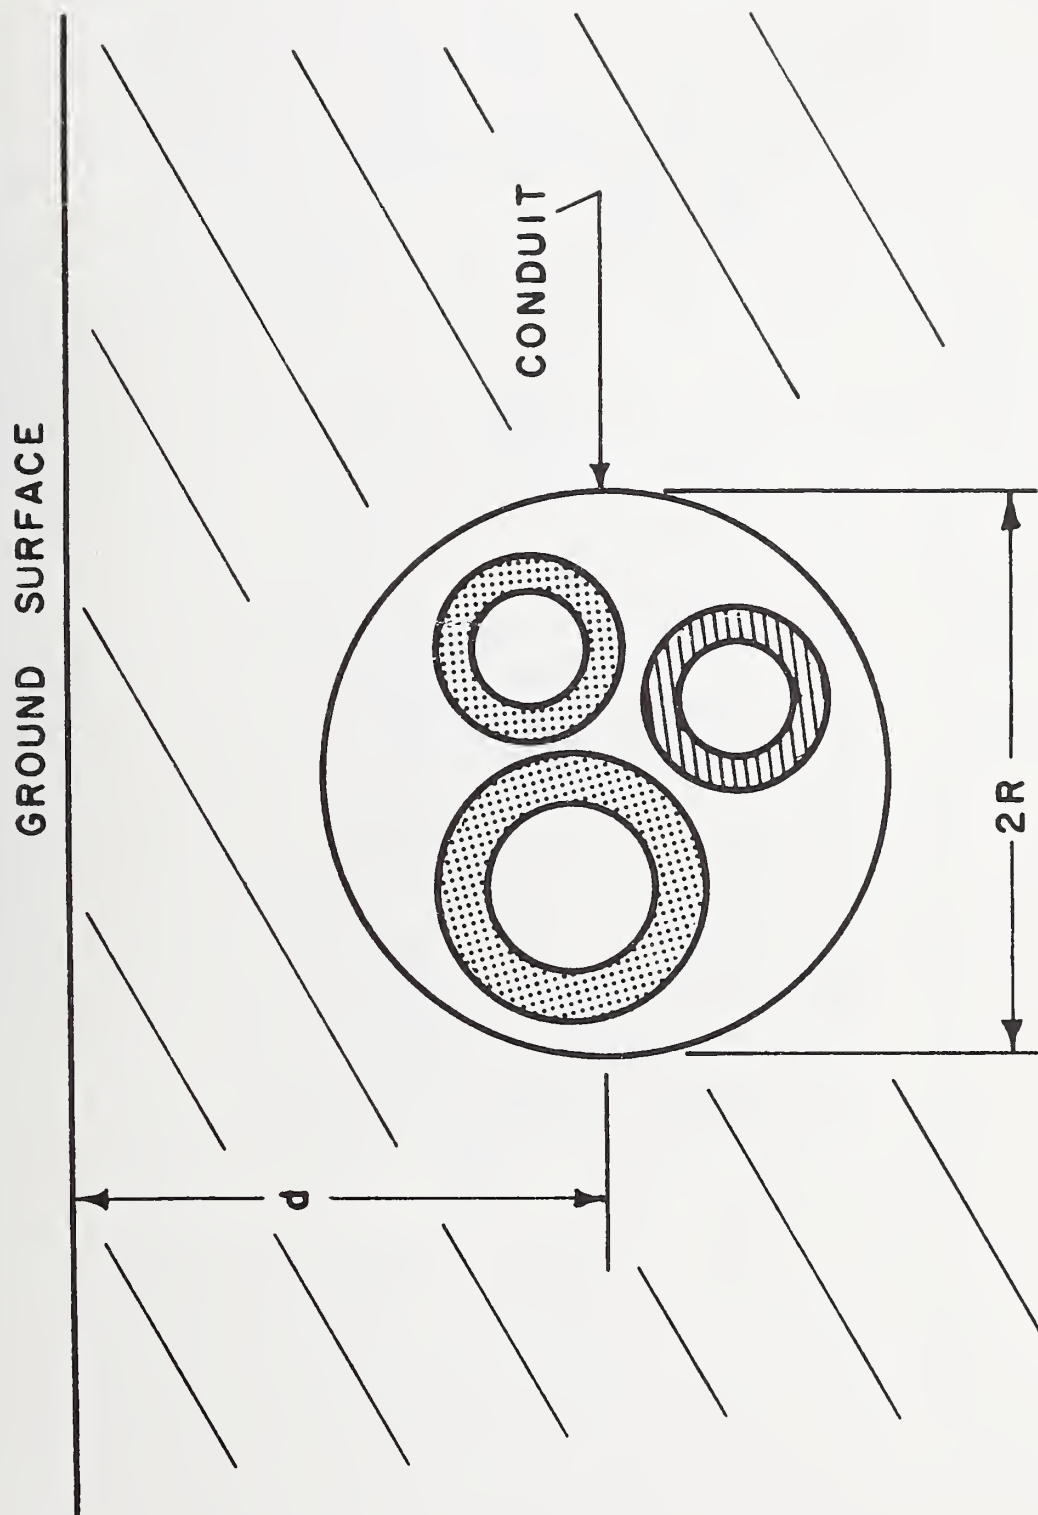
PIPES IN AN UNDERGROUND CONDUIT
